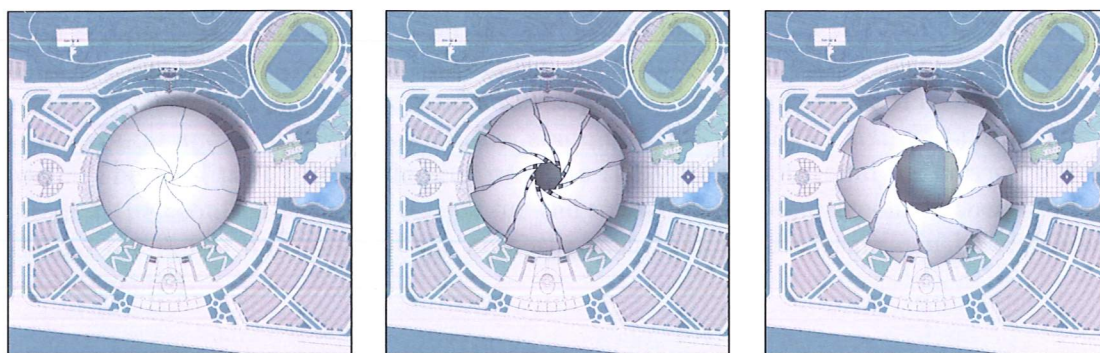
Proposed use of plate structure to cover a sporting venue
